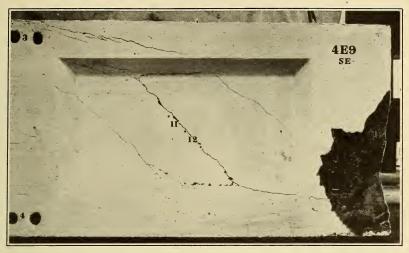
Diagonal tension failure of beam 4E9 having 8.5-inch web and vertical bars
